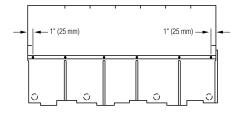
Use six nails and four spots of asphalt roofing cement on steep slopes.
